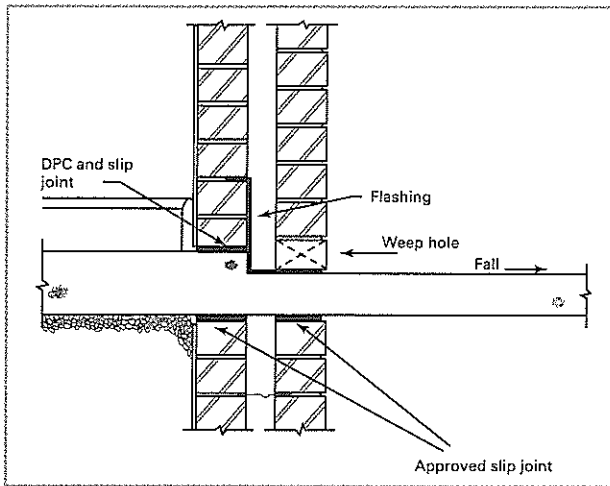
Suspended concrete floor with balcony projection at first floor level
